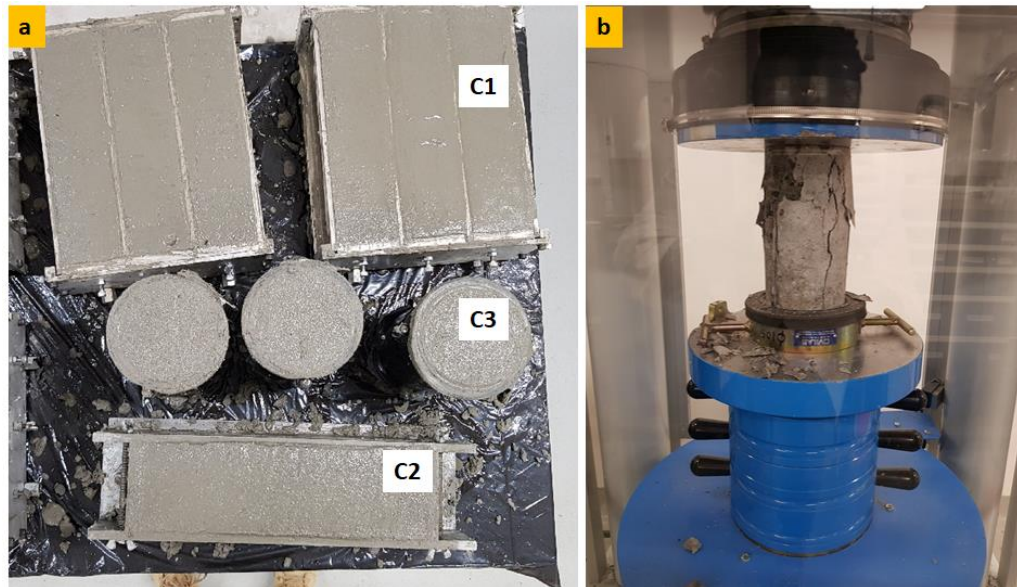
Photograph of (a) concrete specimens cast for the various tests and (b) concrete cylinder during 28 days compressive strength testing
